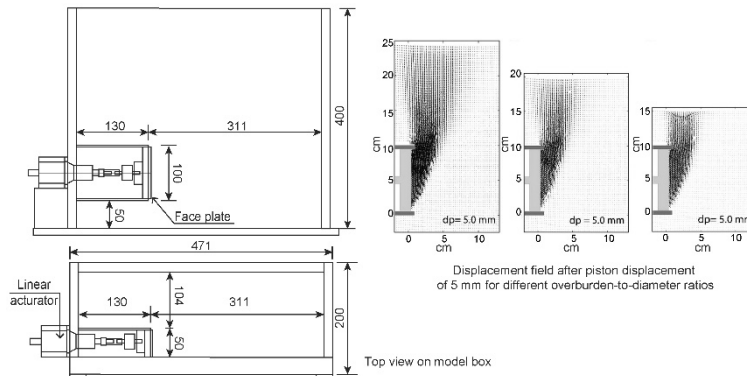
Centrifuge model test on the face stability of shallow tunnel (Idinger et al., 2011)
